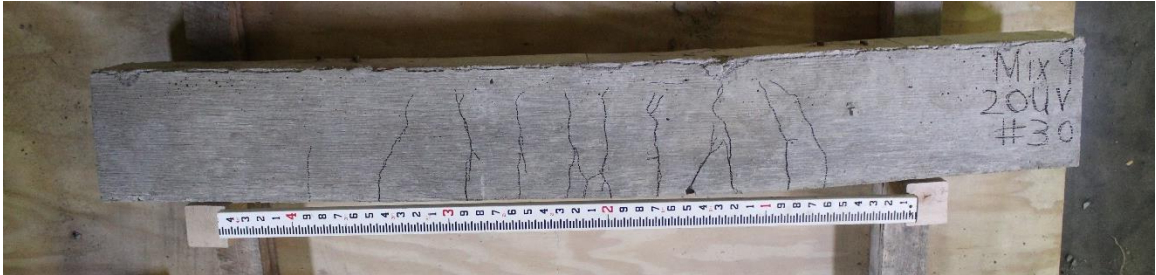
Mixture 9 (20UV) beam #30: concrete beam side view.
